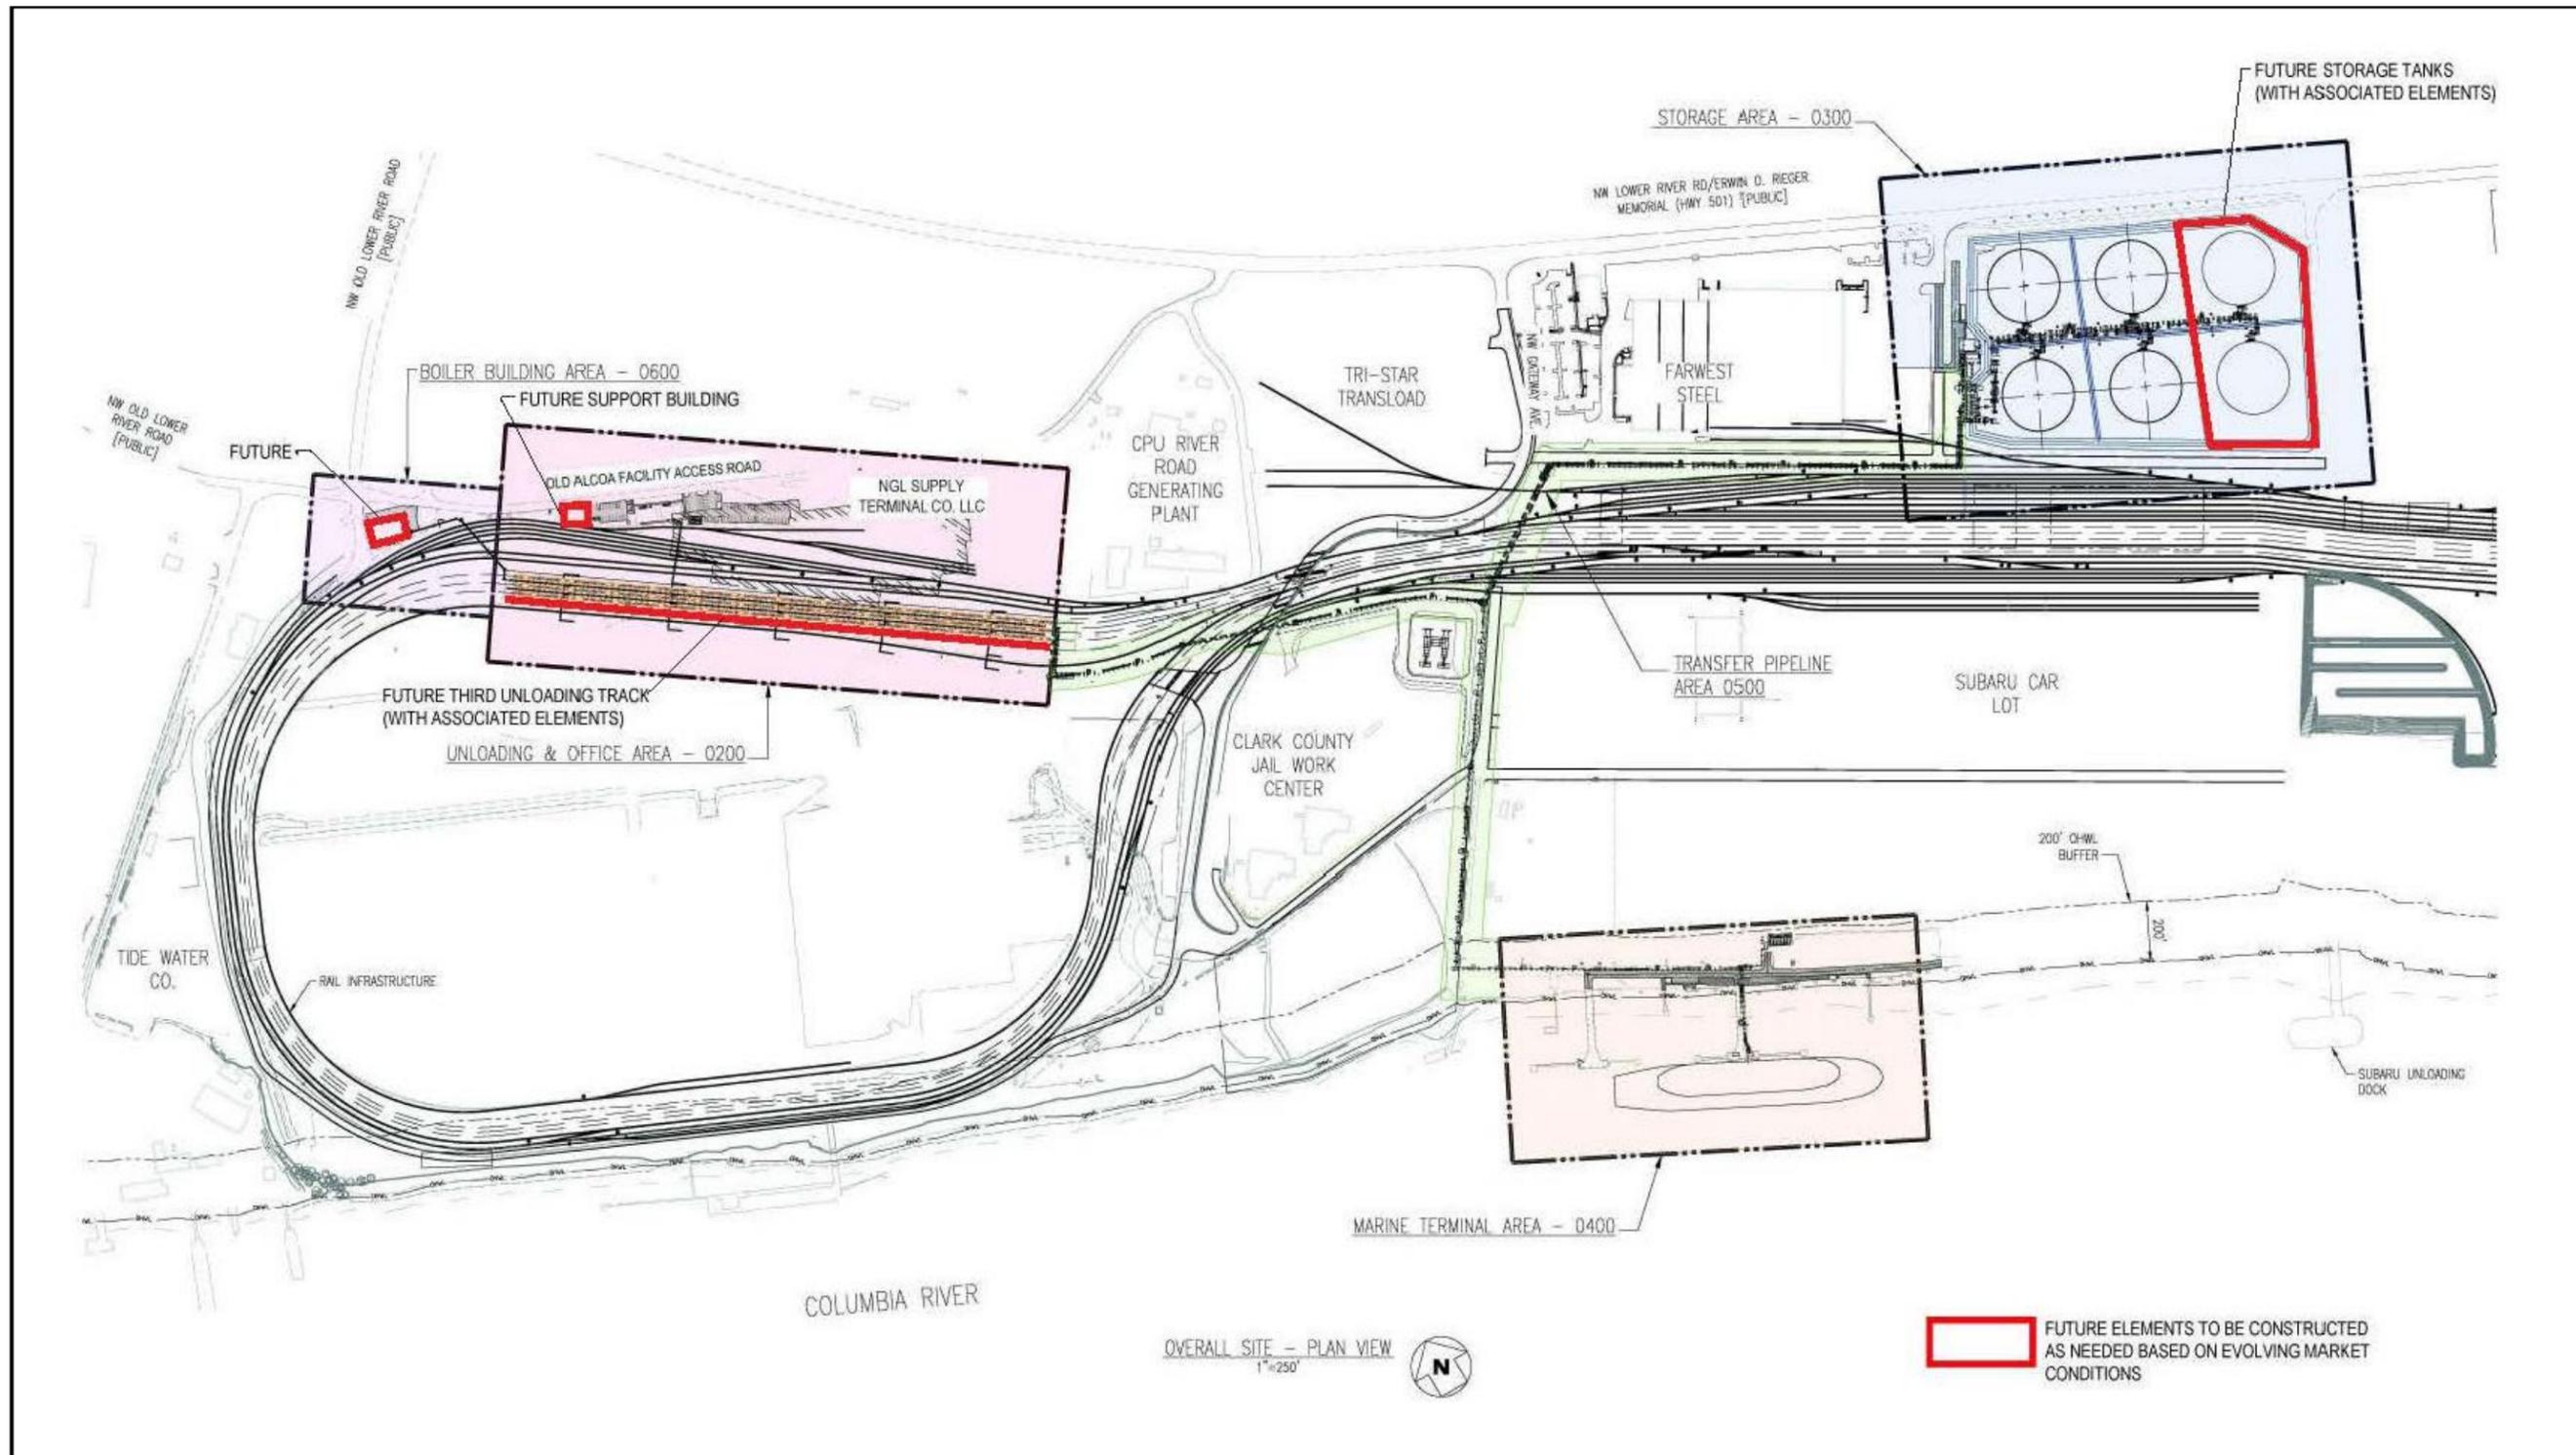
Overall Site Plan – Facility Elements Potentially Deferred (Revised)
